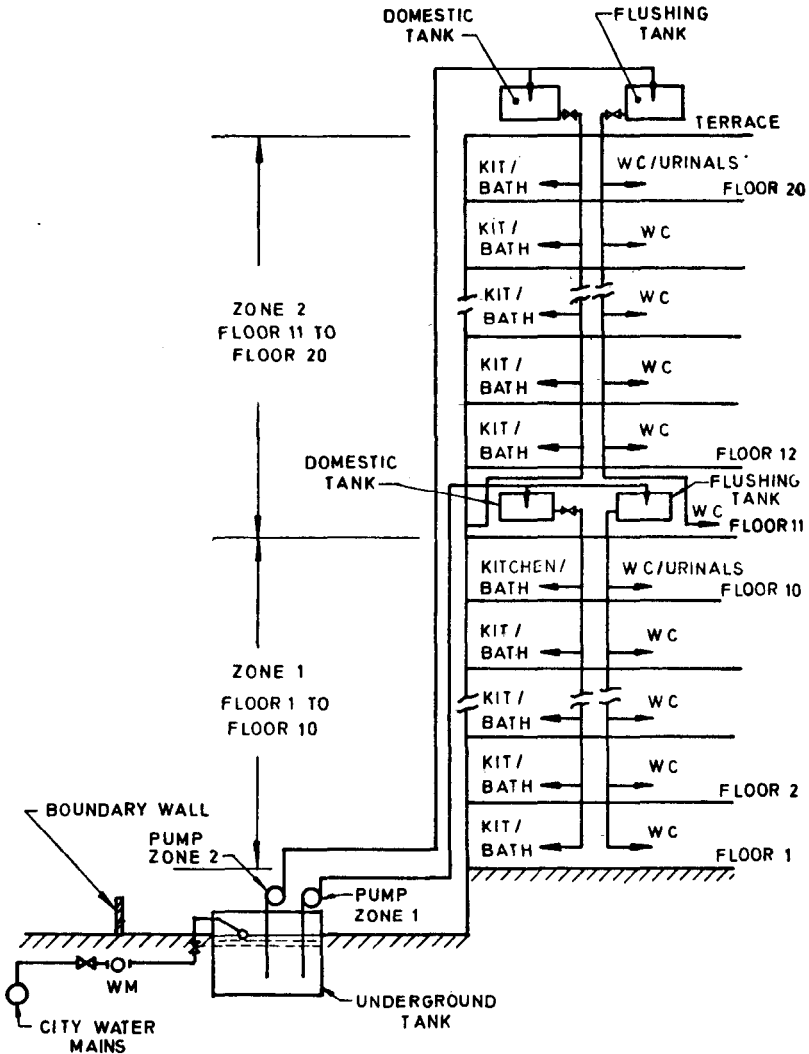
HYDRAULIC ZONES FOR TALL BUILDING
